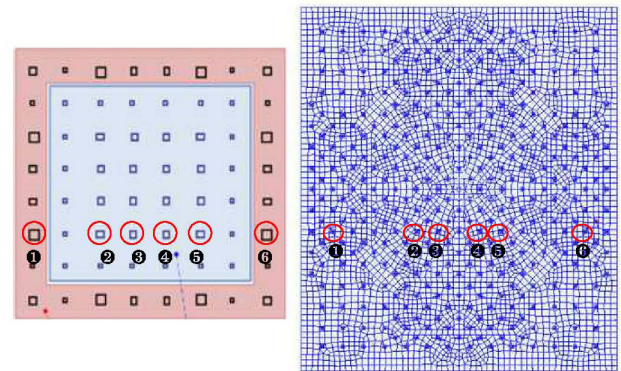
Locations for measurement about deflection of footing slab and axial force of pile
